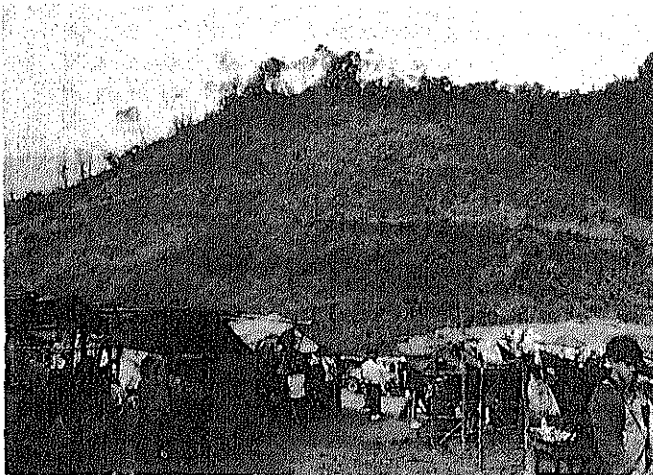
No damage at a slope face where vegetation was performed seed spraying) as pilot construction. (206 km position)
